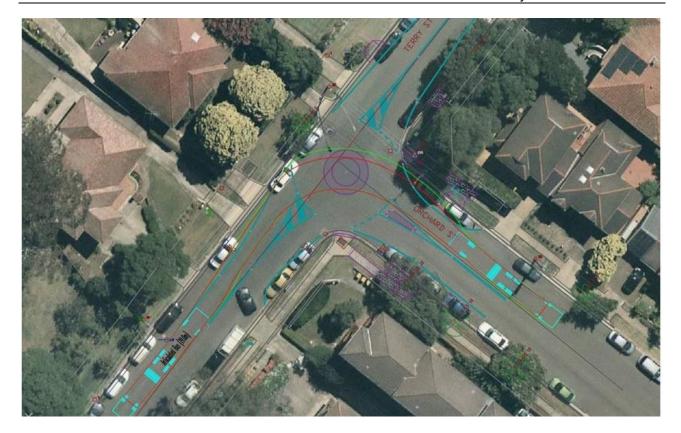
Turning path manoeuvres of rerouted 500X through the roundabout intersection of Terry Road/Orchard Street
